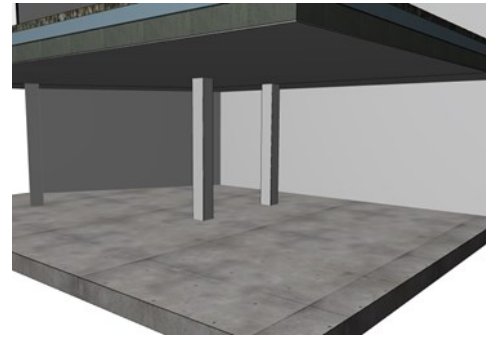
An example of construction elements (wall, ceiling, pole) used in creating a virtual multi-family building, (source: own study)
